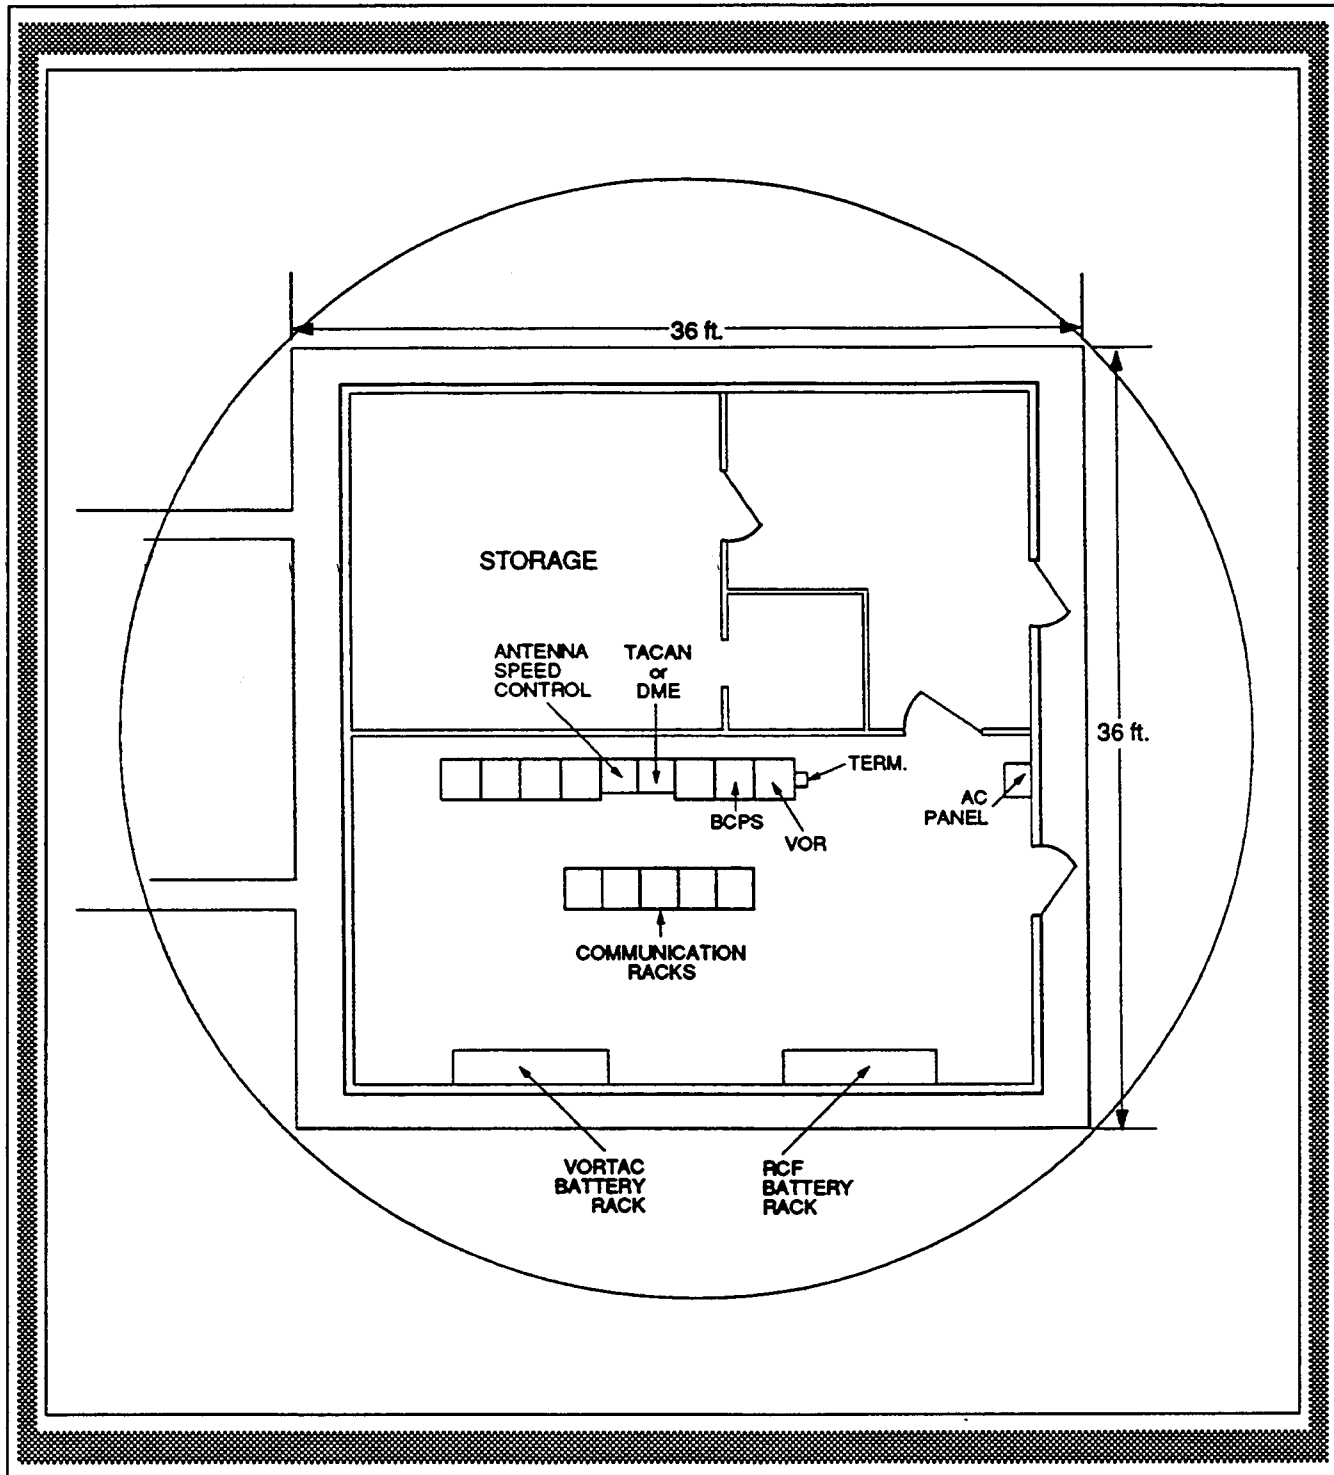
RCF/VORTAC COLLOCATED IN A 36'x 36' BUILDING
